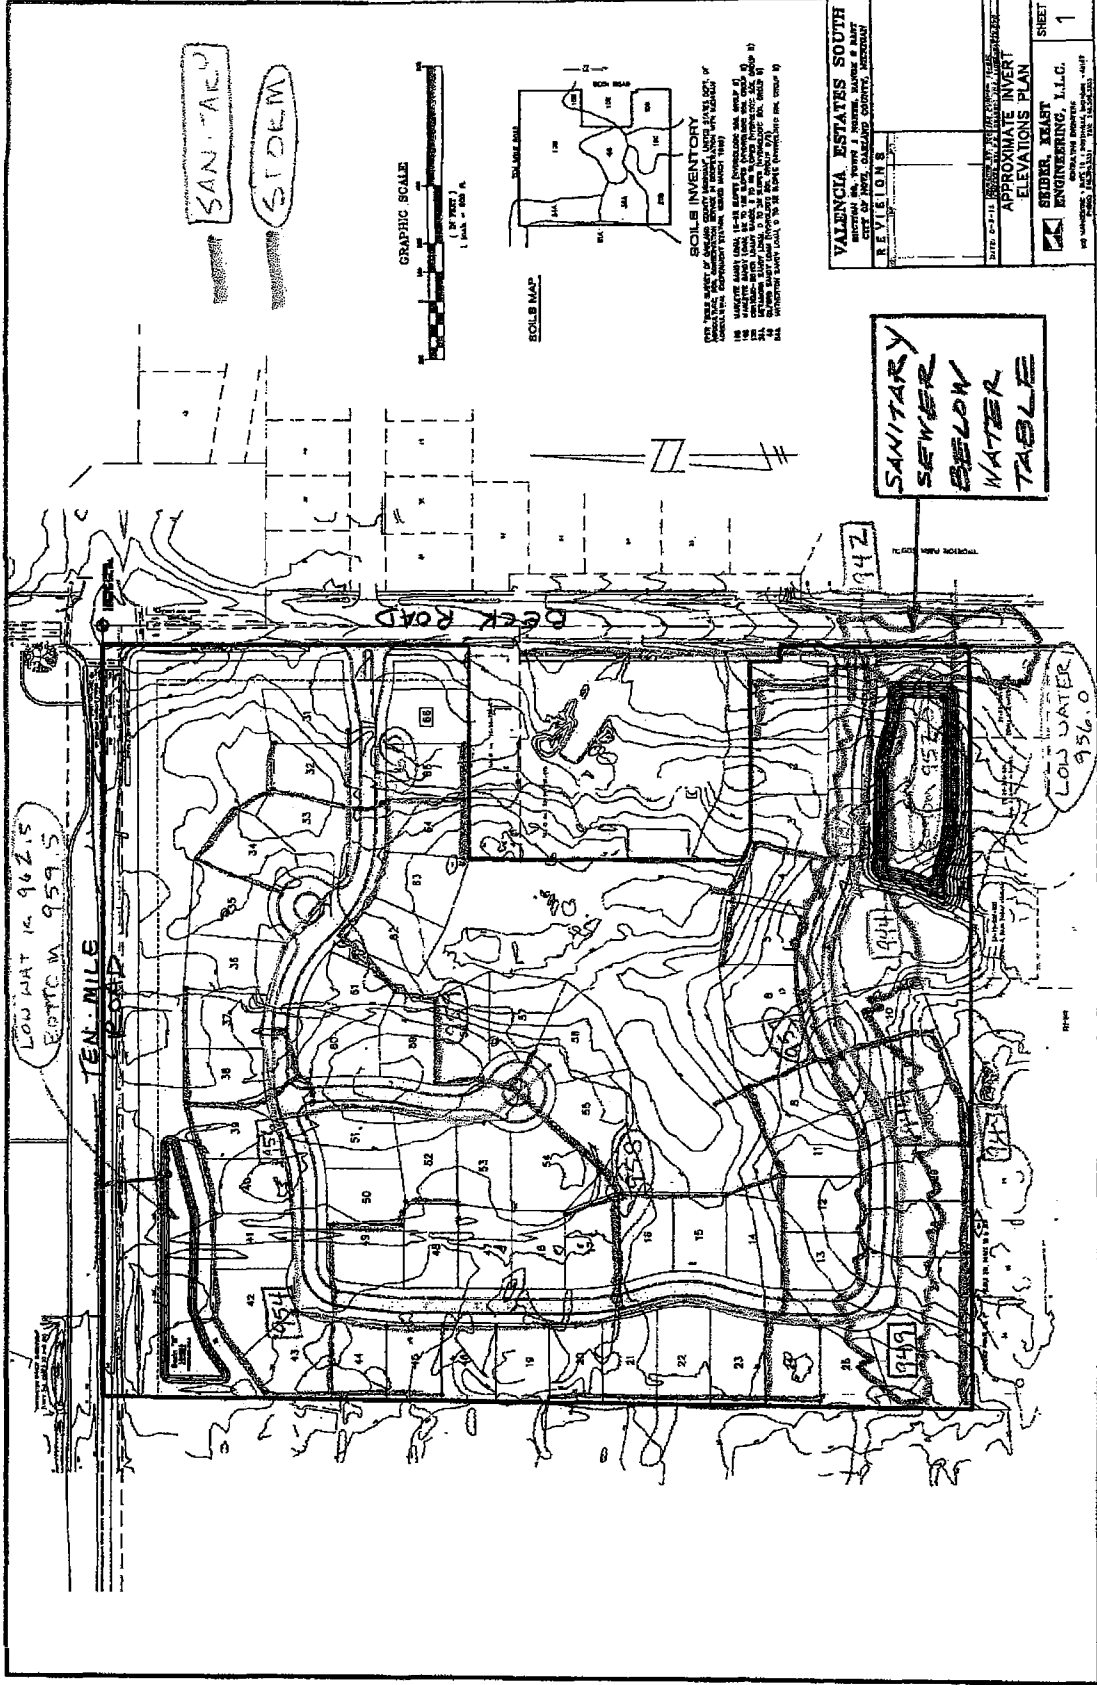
APPROX. INVERT ELEVATIONS PLAN
